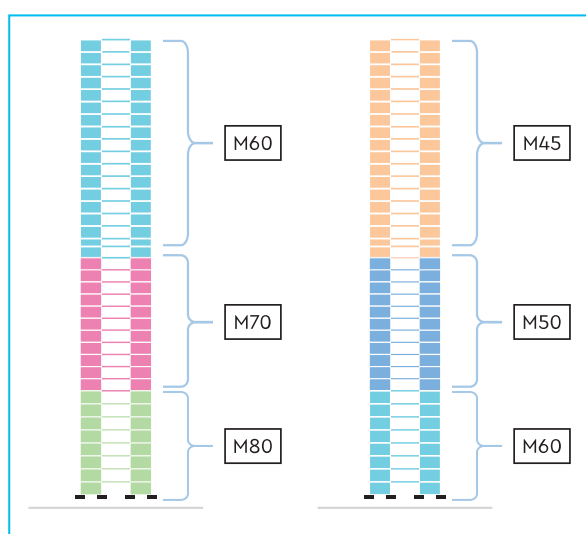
Elevation showing Concrete Grade variation in Sheat Wall /columns Alternatives 01 and 02
